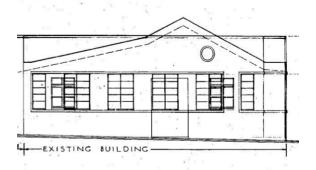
Part of the eastern elevation showing the proposed works to the original façade to the Motor Garage along Bay Street
